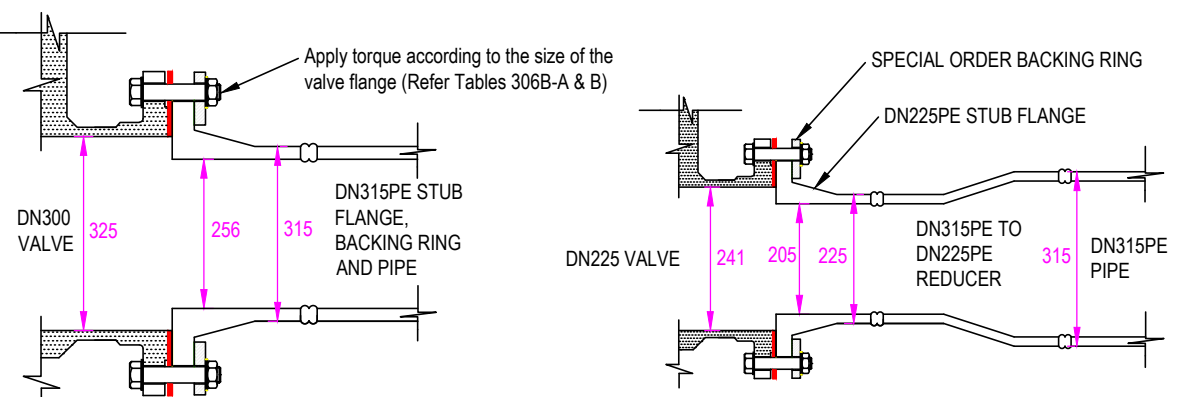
B-C: ALTERNATIVE DN315PE VALVE ARRANGEMENTS
